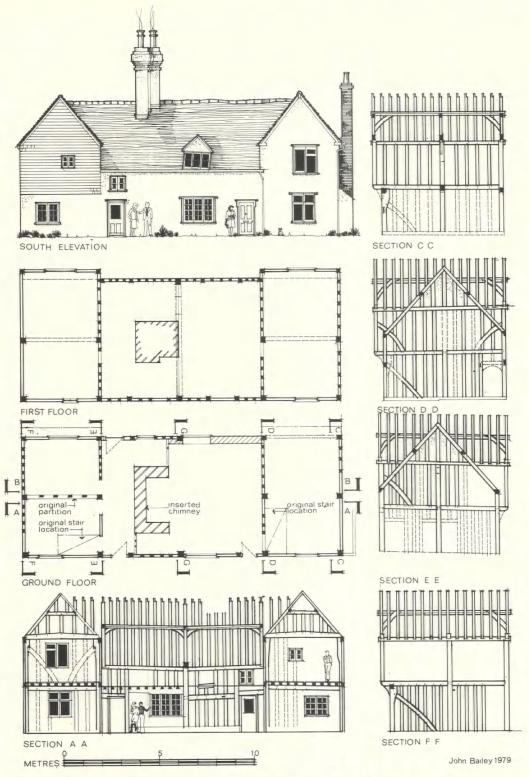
Clawdershill Farm, Shillington: plans, elevation and sections.
